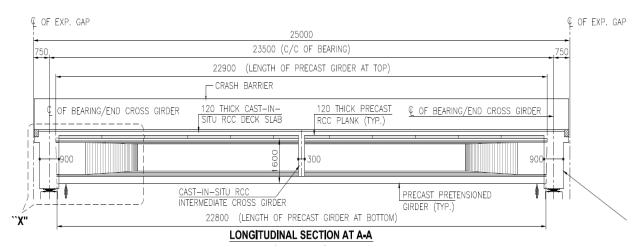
Longitudinal Girder Section of 25m c/c exp joint
